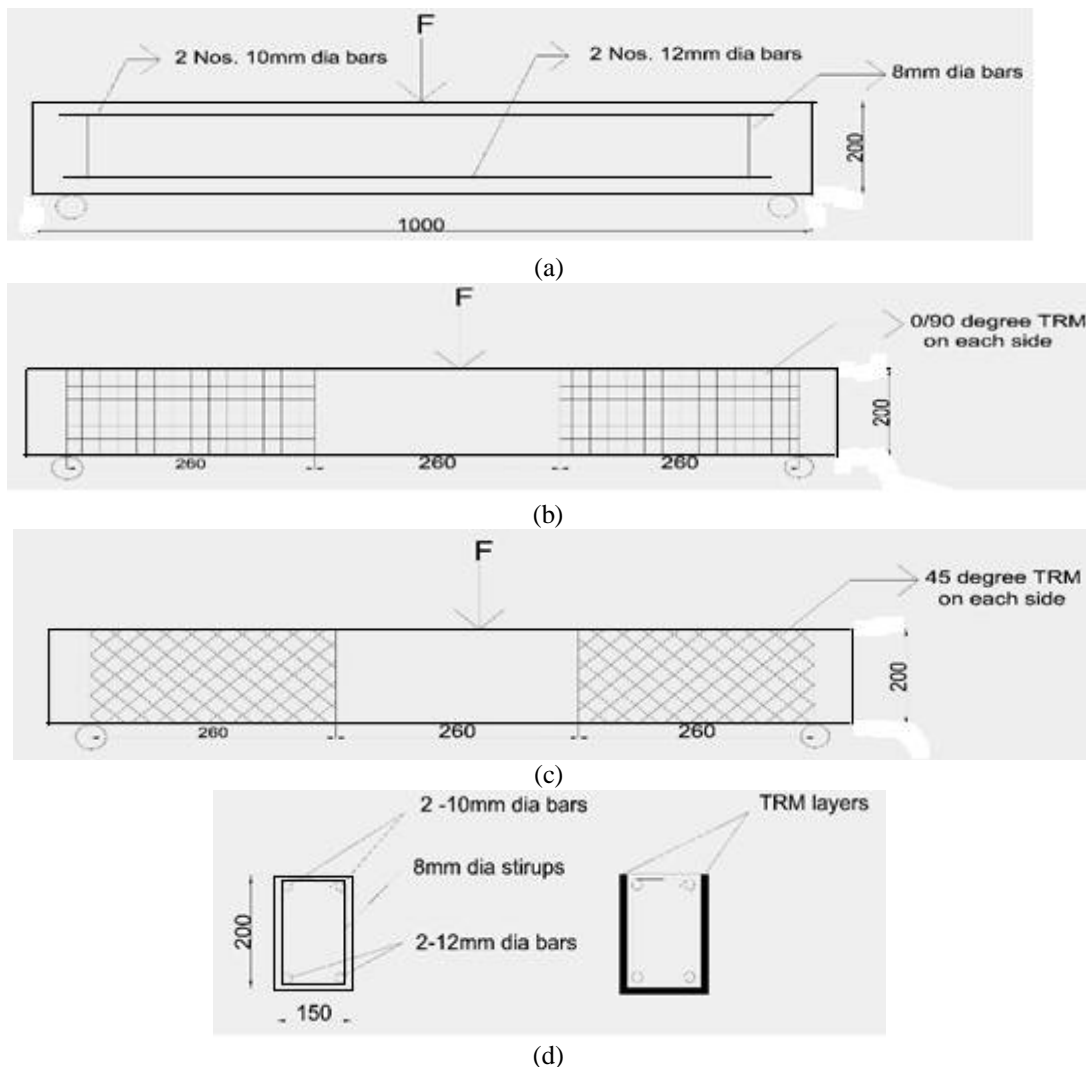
Detailing of Test beams (a) Control Beam (b) Beams with 0/90° textile orientation (c) Beams with 45° textile orientation (d) Cross section of beams
